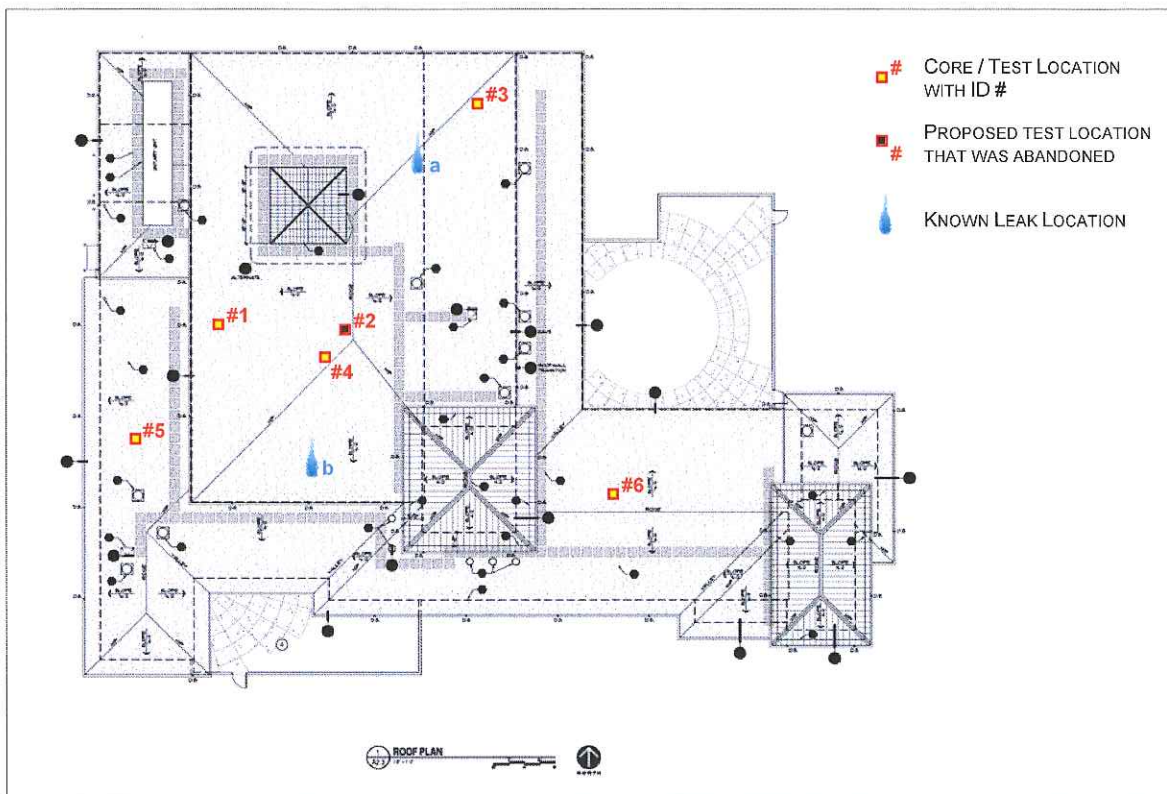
Roof plan with core / test locations and known leak locations.
